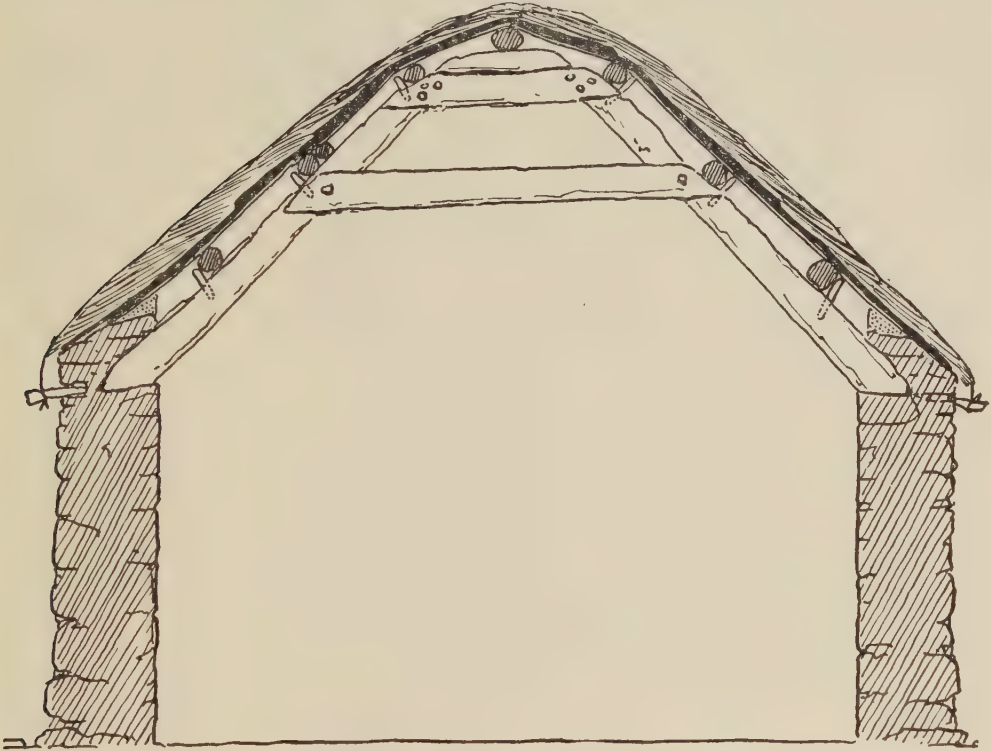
CROSS-SECTION OF HOUSE IN ERRIGAL DISTRICT, DONEGAL, SHOWING ROOF CONSTRUCTION
